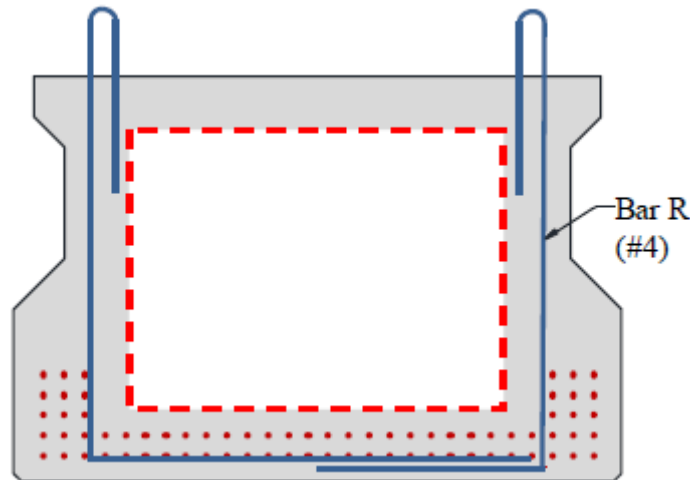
Reinforcement detail and debonding pattern for the specimens (5XB40)(Avendano et al. 2013)
